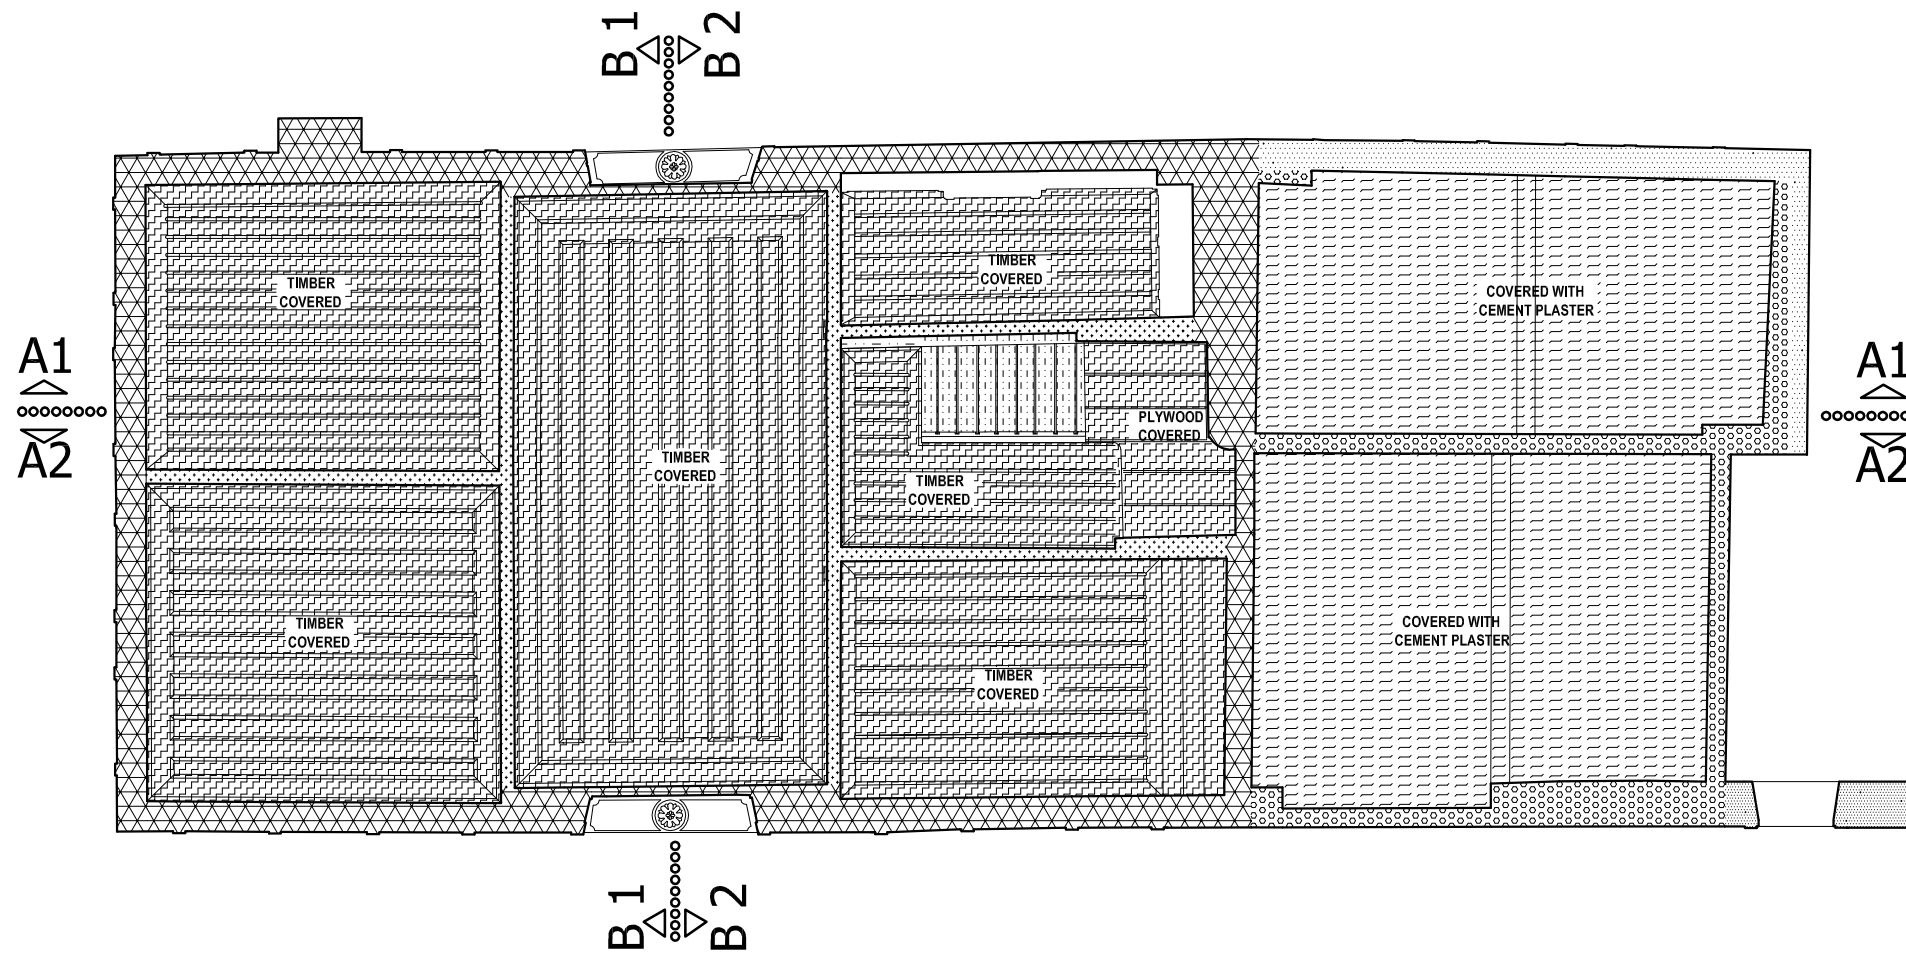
Analysis of Structural Characteristics- Ground Floor Ceiling Plan
